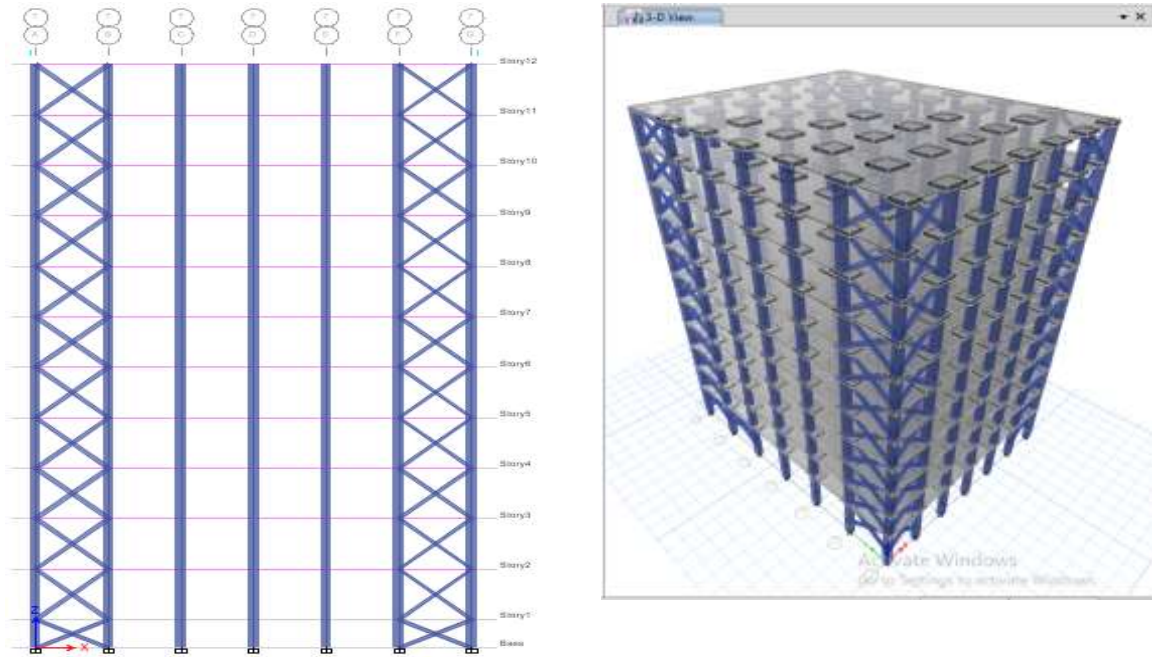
Elevation and 3D view of Multi-storey building with Cross bracing at corner side
